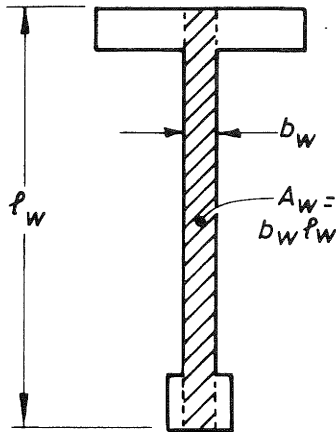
Effective Shear Area of a Flanged Wall Section.
